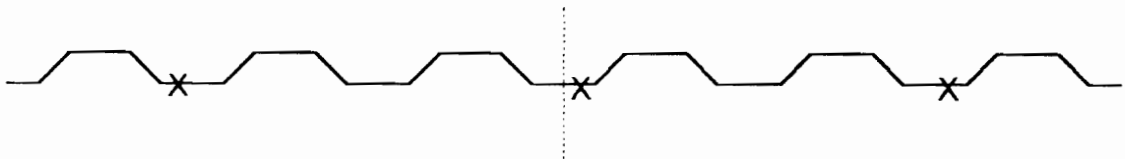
SDI-2/18-3-9 Concrete Strain Gage and Shear Stud Locations
